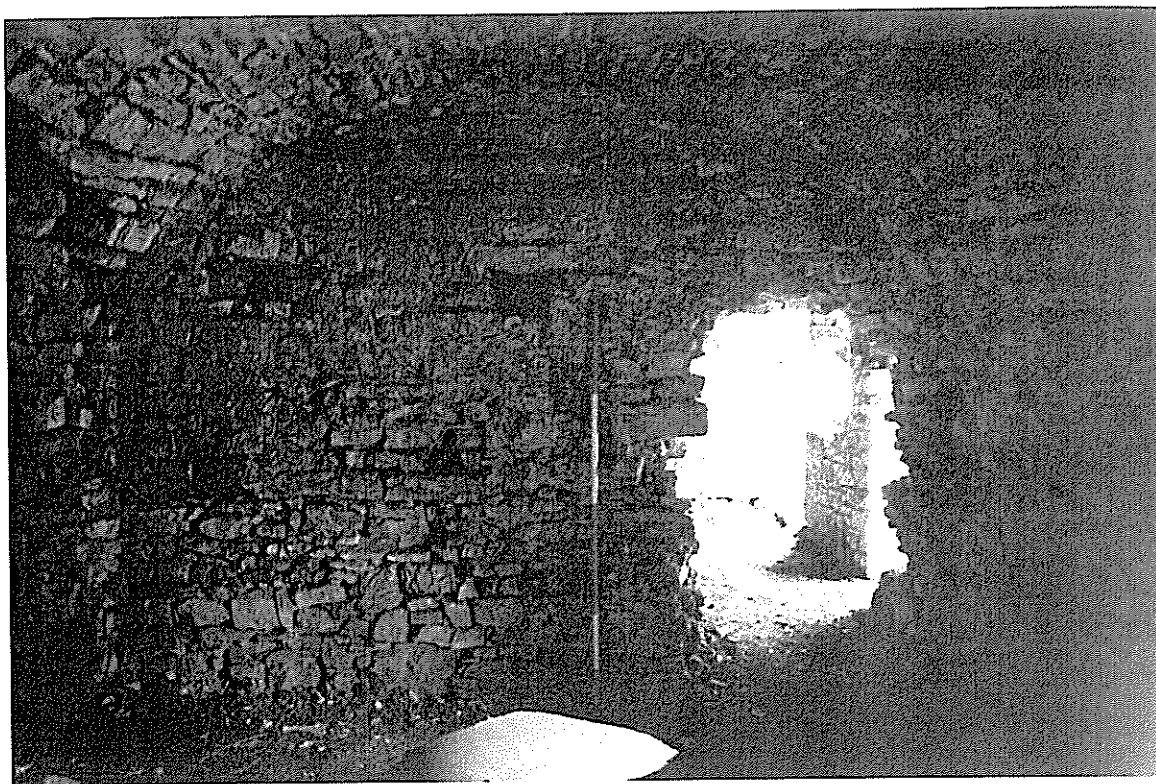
Lydstep Palace, Room 2 interior: West wall
